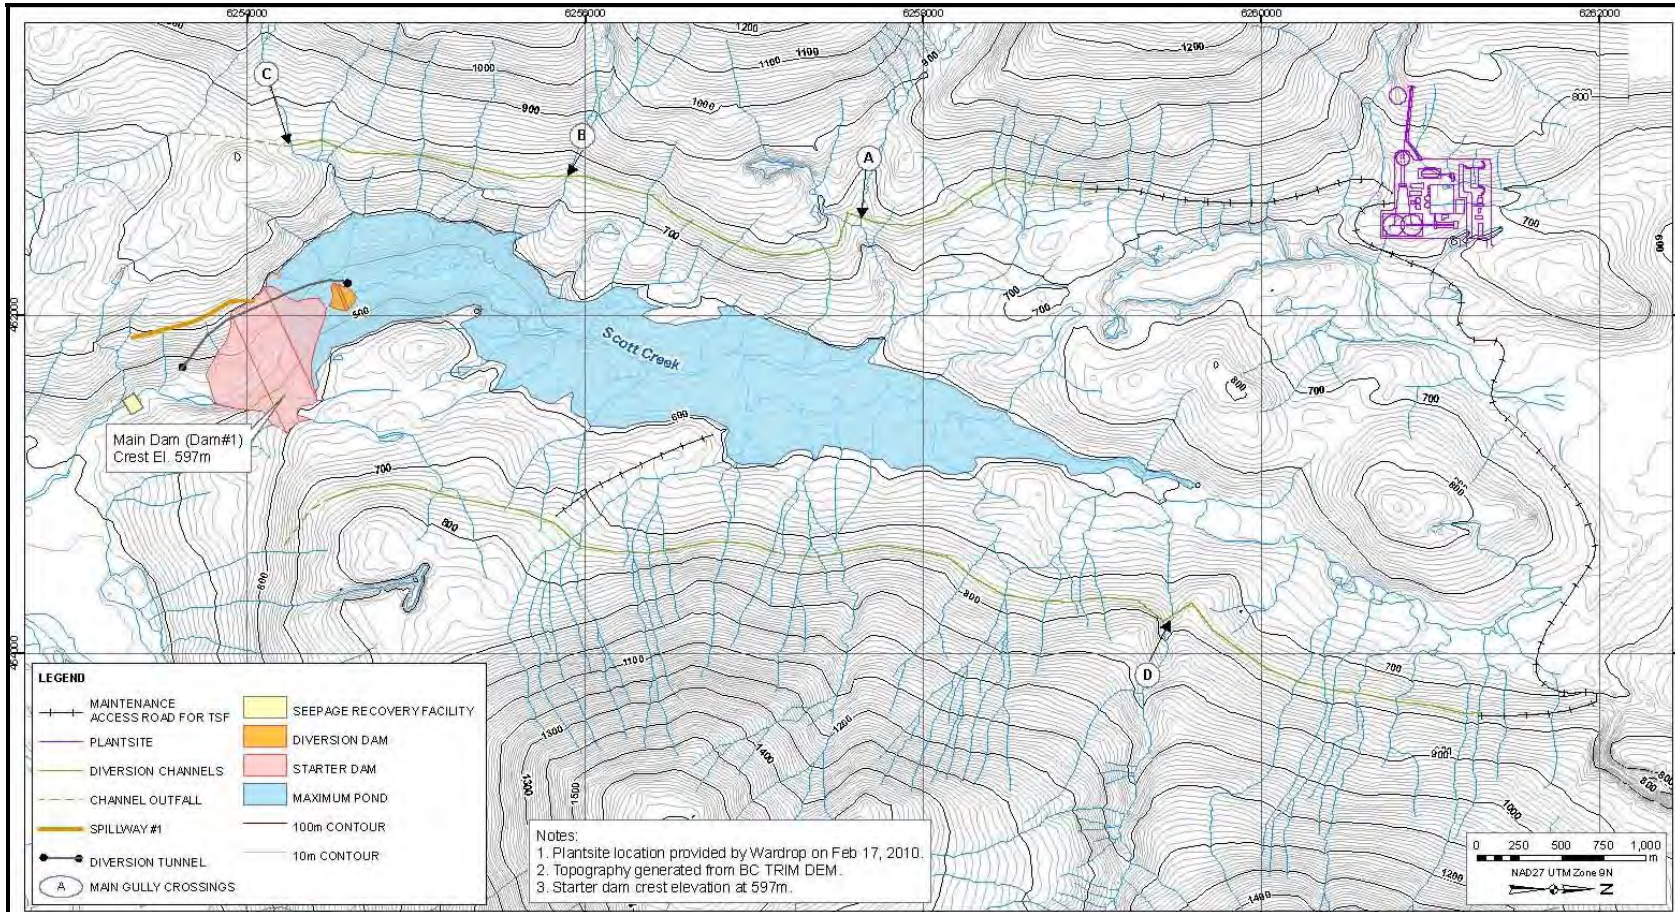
Scott Creek – Proposed TSF – Ultimate Dam Layout Plan
